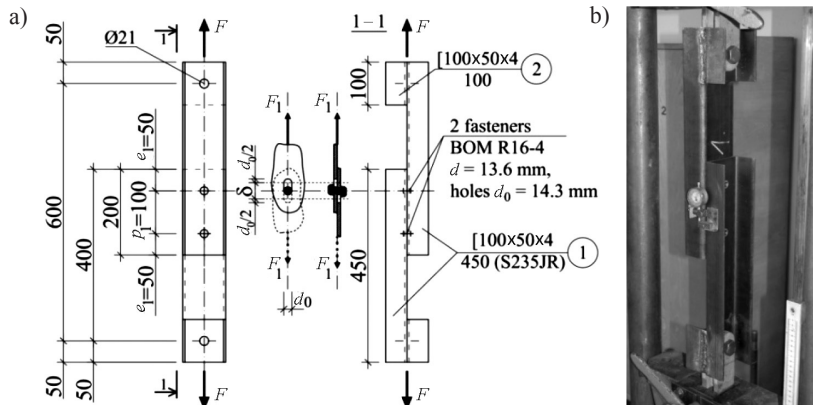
Axially loaded test element “I”: a) structure and dimensions, b) view of the element anchored in the testing machine
